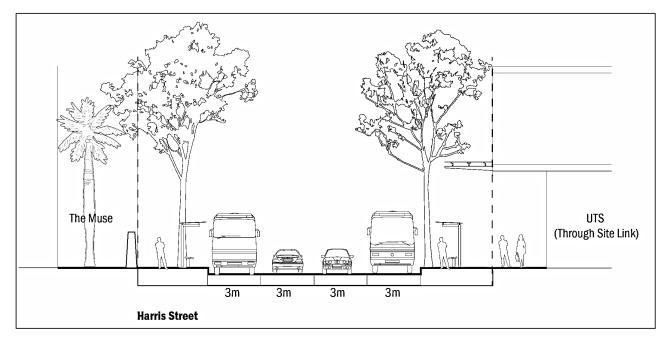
Site elevation / section 3: Harris Street (Hassell)
